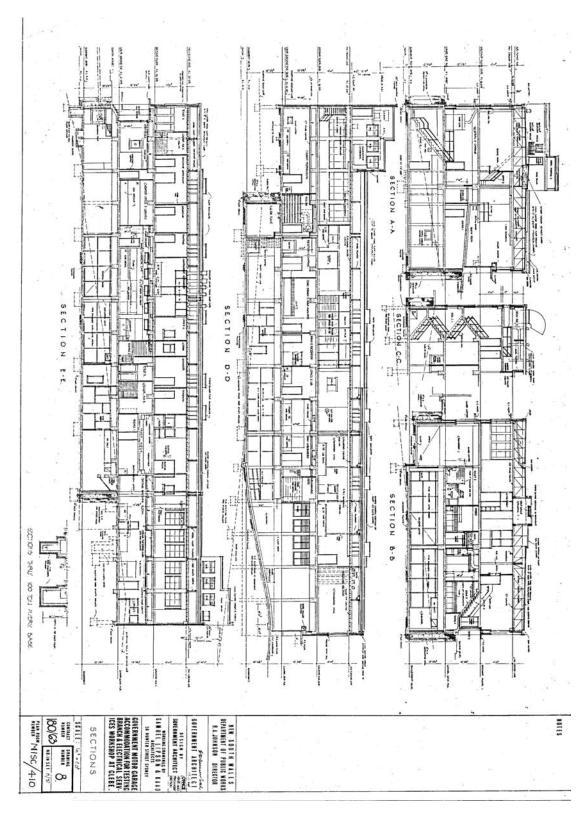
Sections of the Testing and Inspection Branch building of the Public Works Department
